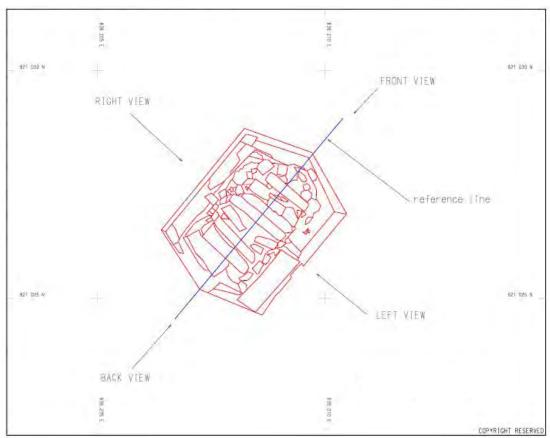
Plan of Supporting Pillar SP6 of Longjin Bridge
